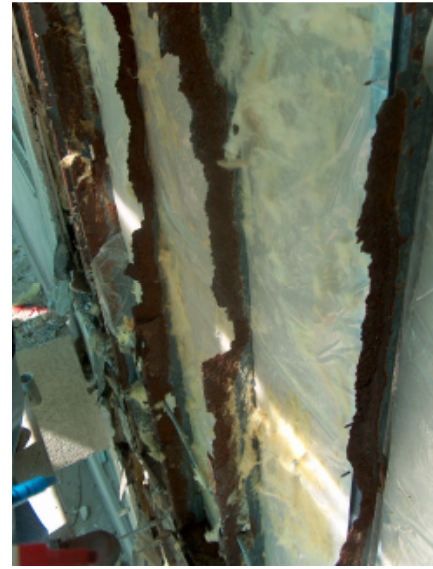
Typical corrosion of the exterior steel studs behind the cladding at exposed portions of the south elevation.
